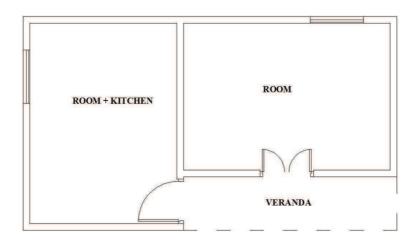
Generic house plan of two rooms found in surveyed areas. Sketch by S. Abidi
